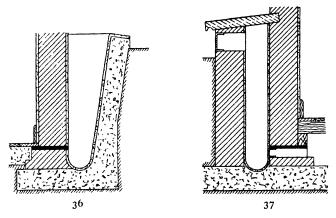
Open area between wall and soil.Fig. 37. Covered dry area between wall and soil.
